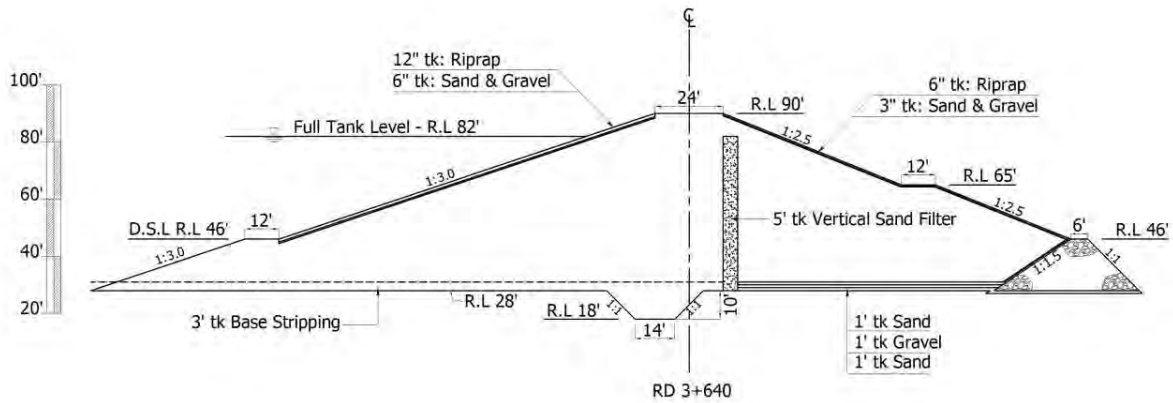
Typical Cross Section of La Gun Byin Reservoir
